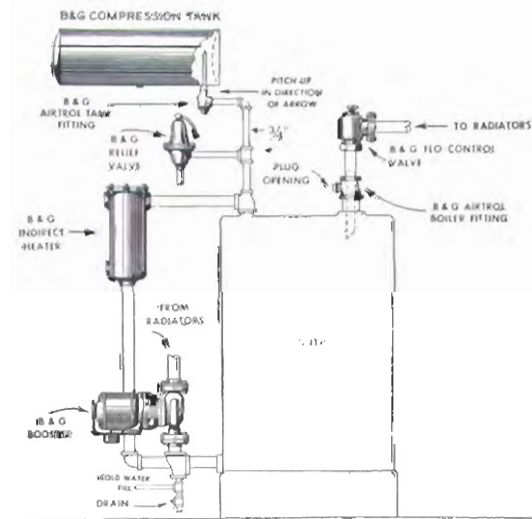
A. B & G Airtrol System installation on boiler, (side view) with external type water heater.
